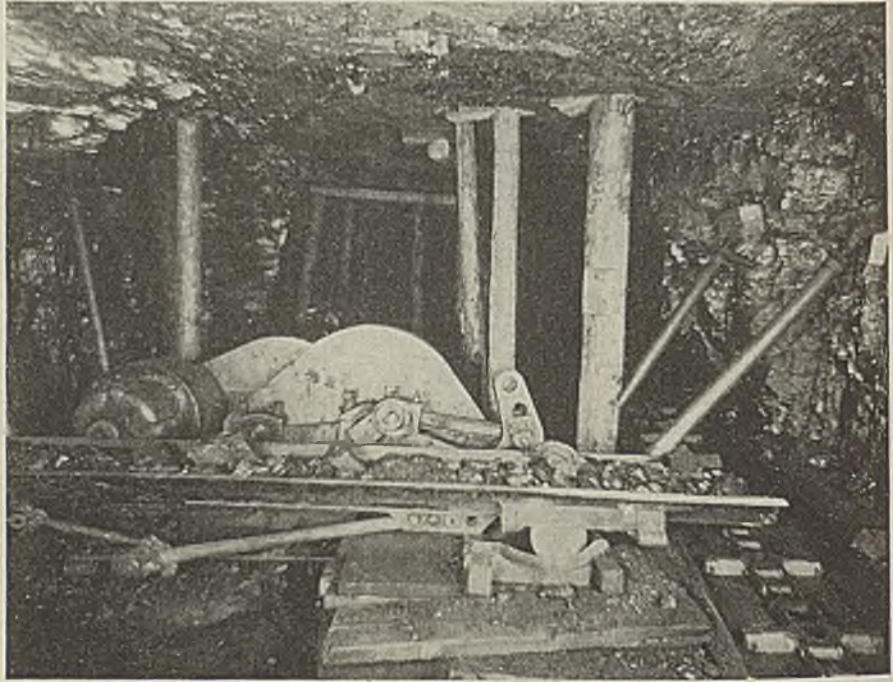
Shaking Pan and Flight Conveyor With Drive for Shaking Conveyor
